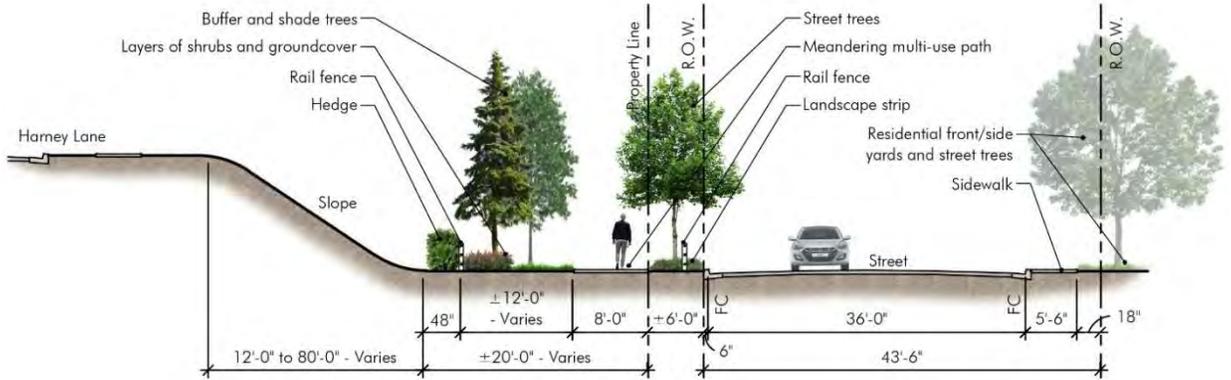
Local Street Parallel to Harney Lane (looking east)
